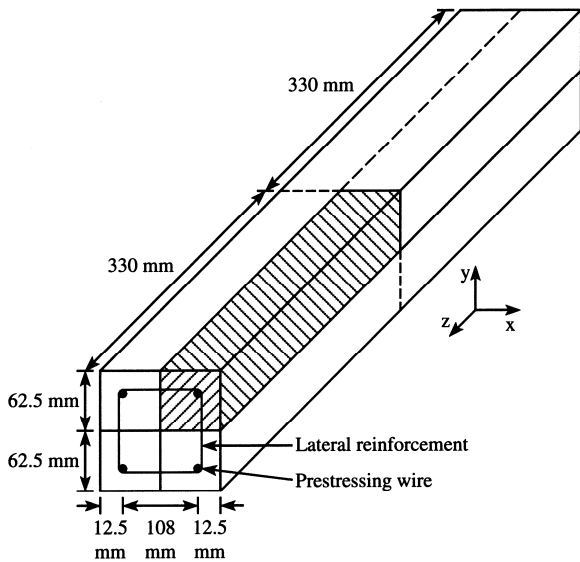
Durrani-Elias specimens for prestressed concrete columns
